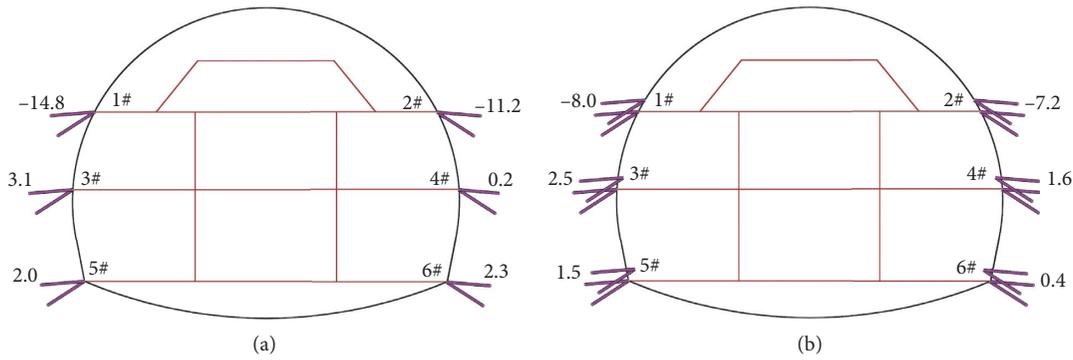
Installation of drawing of feet reinforcement bolt axis dynamometer.
